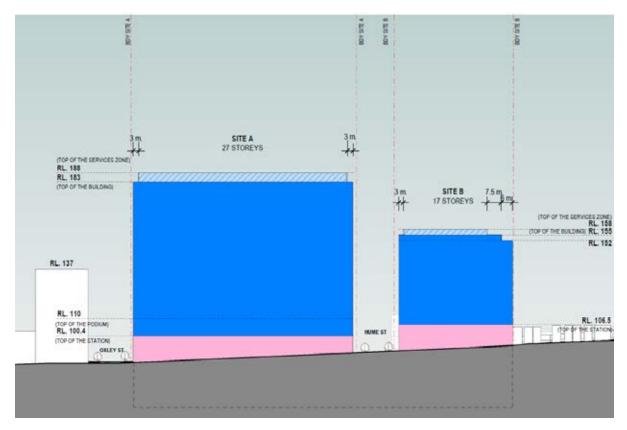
West Elevation of Building Envelope – Pacific Highway
